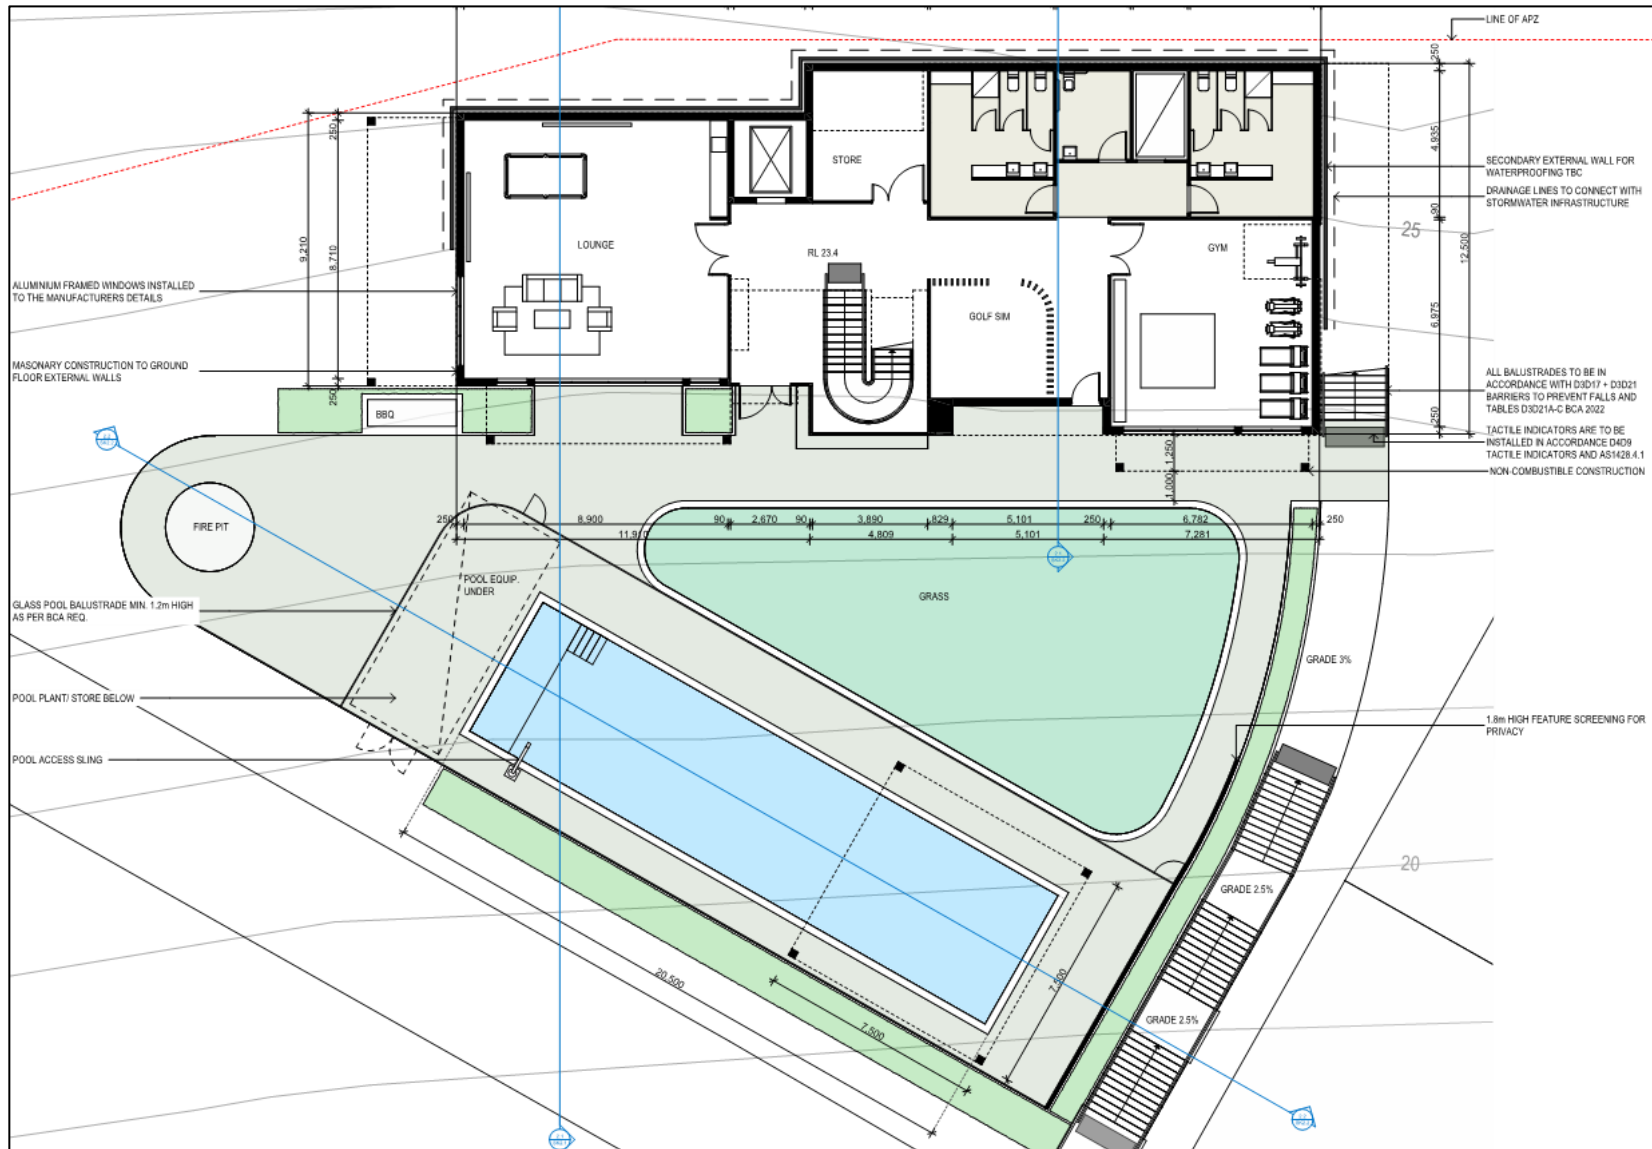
Proposed Clubhouse Ground Floor Plan (Source: King + Campbell, 2025)
